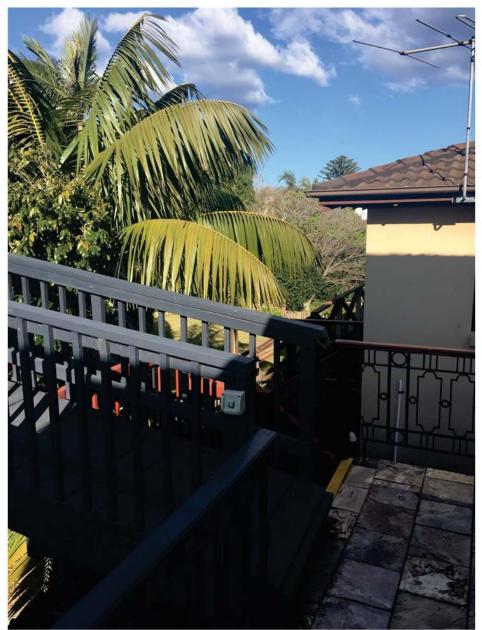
Photo taken from the existing balcony toward non-compliant setback (with ramp in location of proposed extension).
